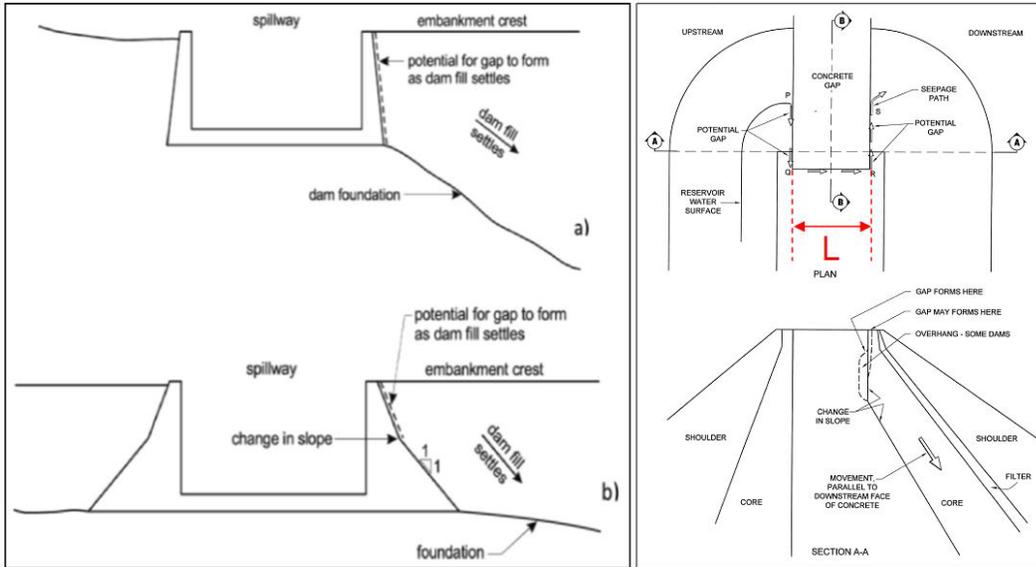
C-9.—Crack or gap adjacent to spillway or abutment walls and embankment-concrete interfaces (Fell et al. 2008).
